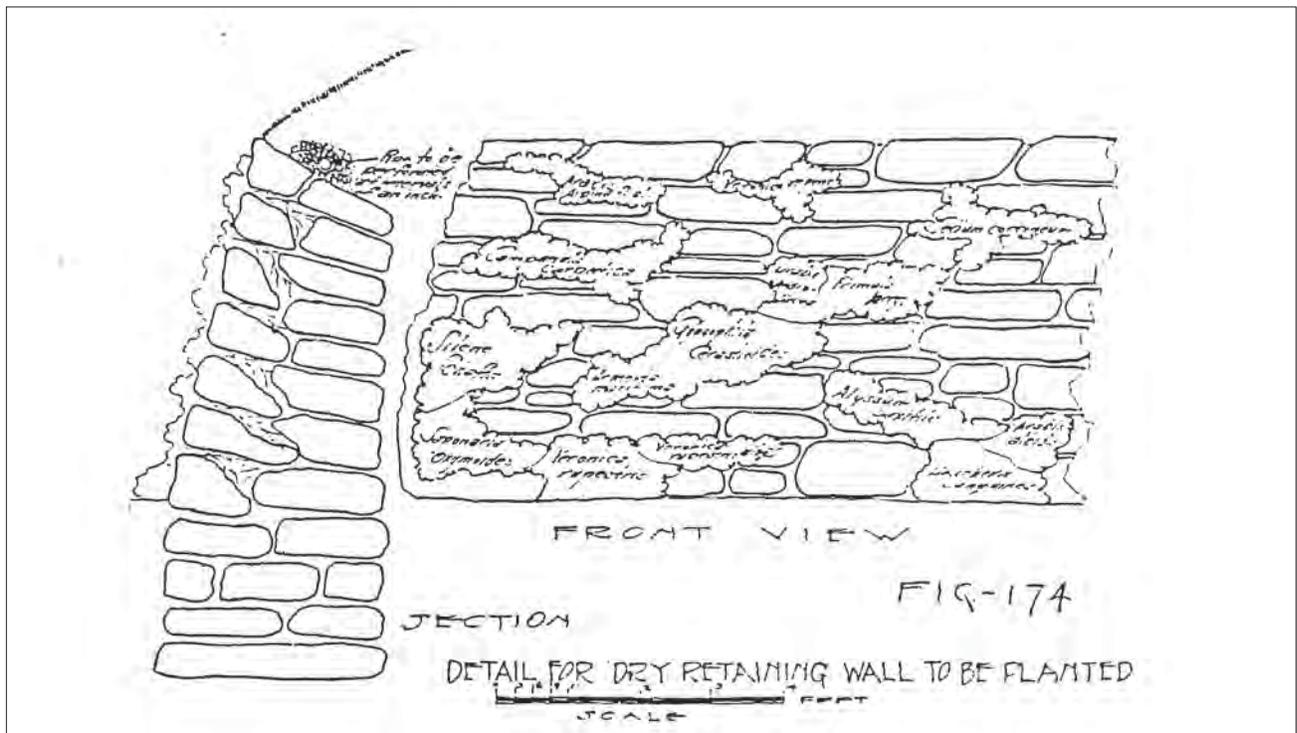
Detail for dry laid stone retaining wall to be planted from Cridland's book, *Practical Landscape Gardening*, 1925.
